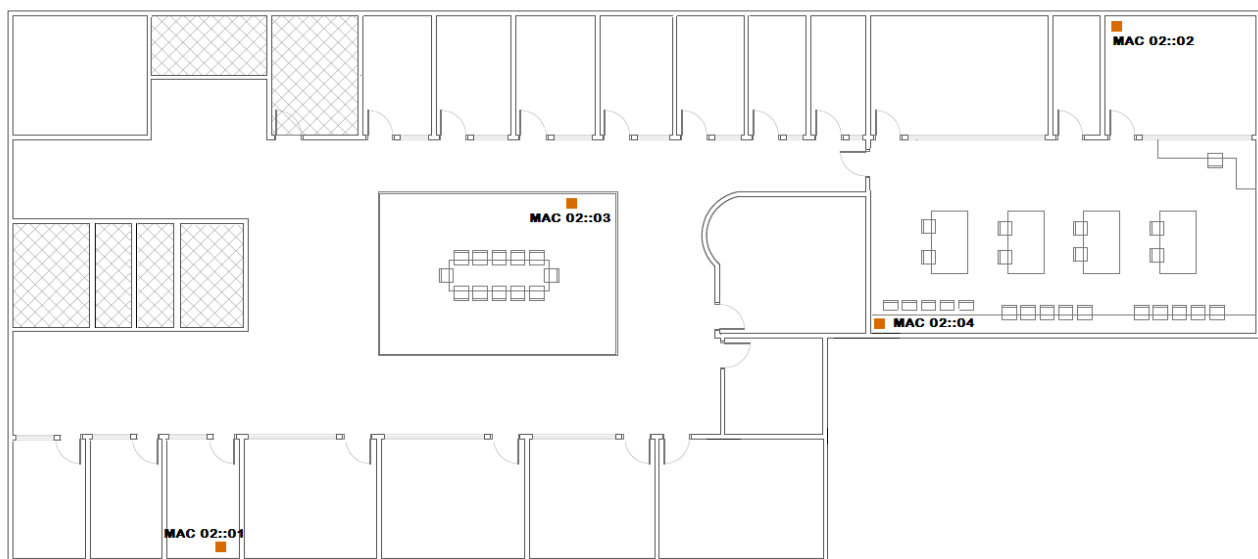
A floor plan of part of the 4th floor indicating where the sensor nodes were placed
